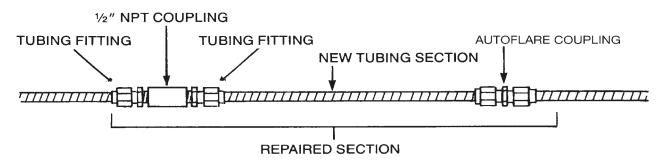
Repair of Damaged Tubing with a New Section of Tubing and a joint splice or an AutoFlare Coupling
